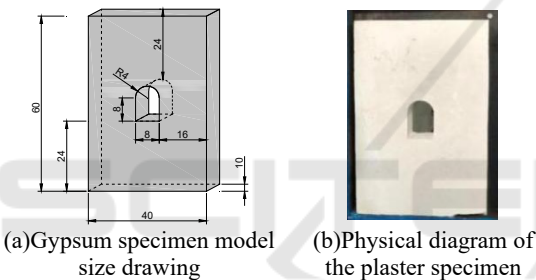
Size drawing and physical drawing of surrounding rock specimen.
